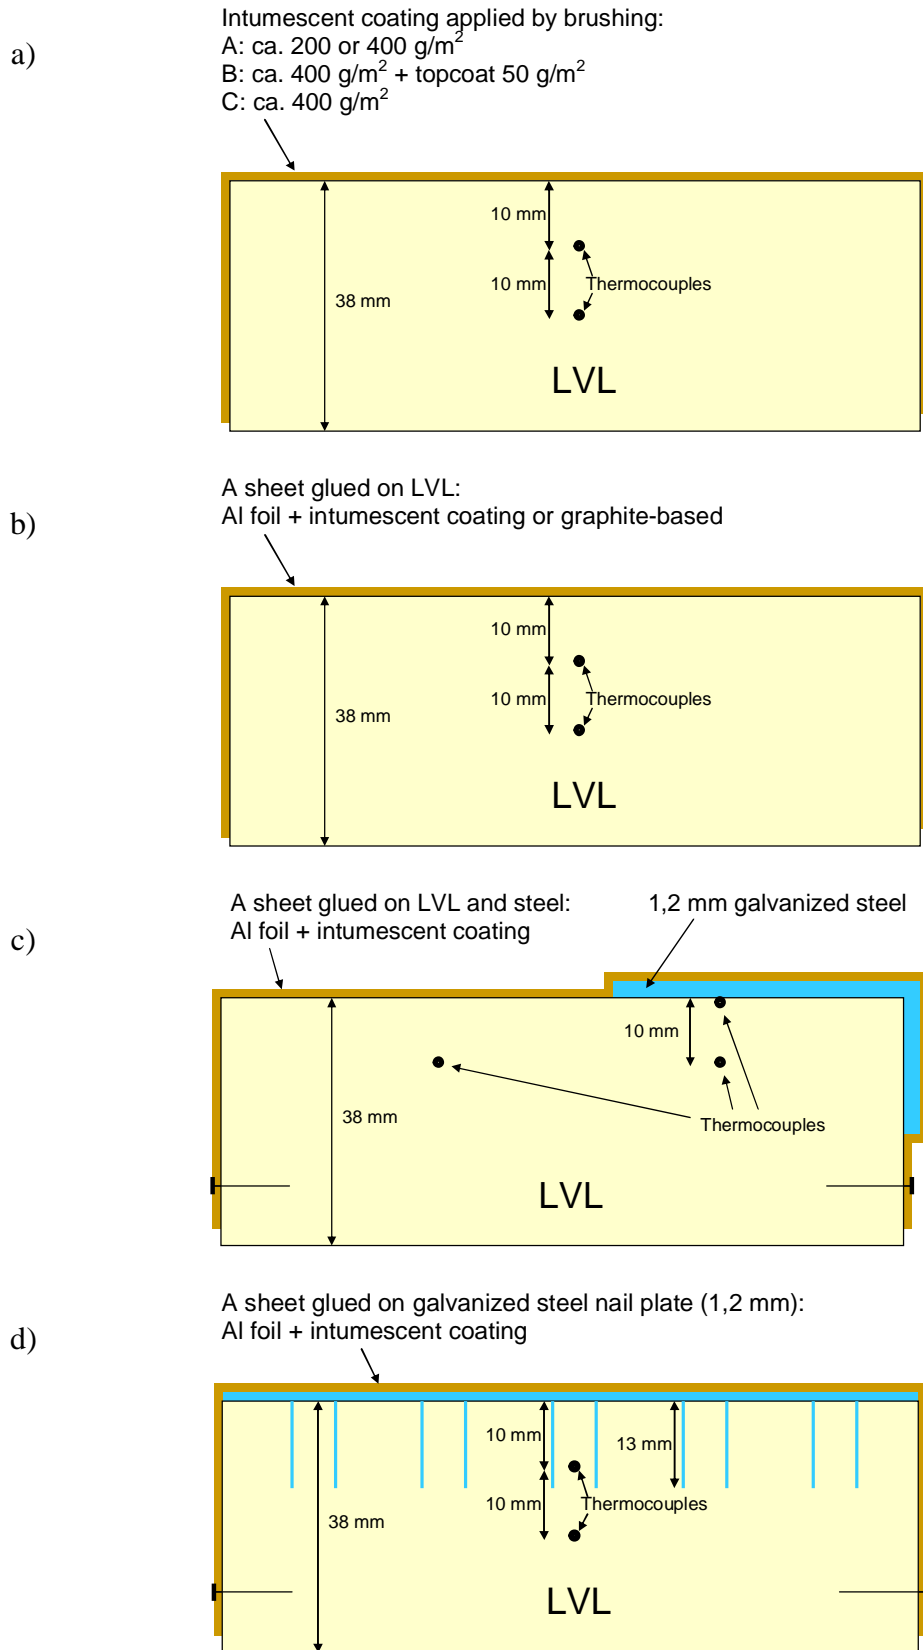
Structure of the coated LVL specimens: a) intumescent coatings applied by brushing, b) sheets glued on LVL, c) a sheet glued on LVL and galvanized steel profile, and d) a sheet glued on galvanized steel nail plate.
